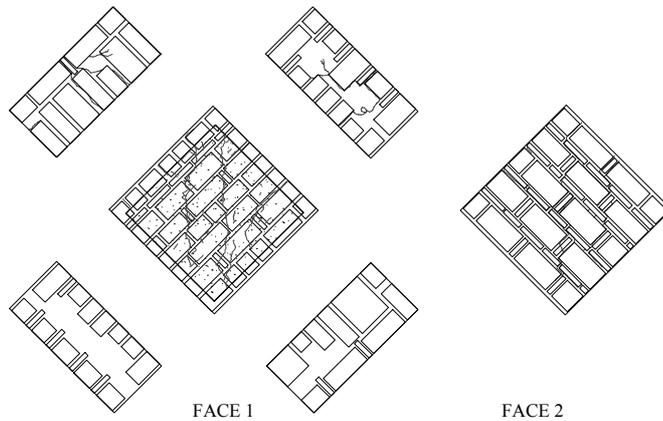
Typical failure mode of specimens subjected to diagonal compression: Wallette 4.
